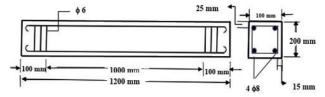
Reinforcement Details of Beams (NC20 & SC20).
